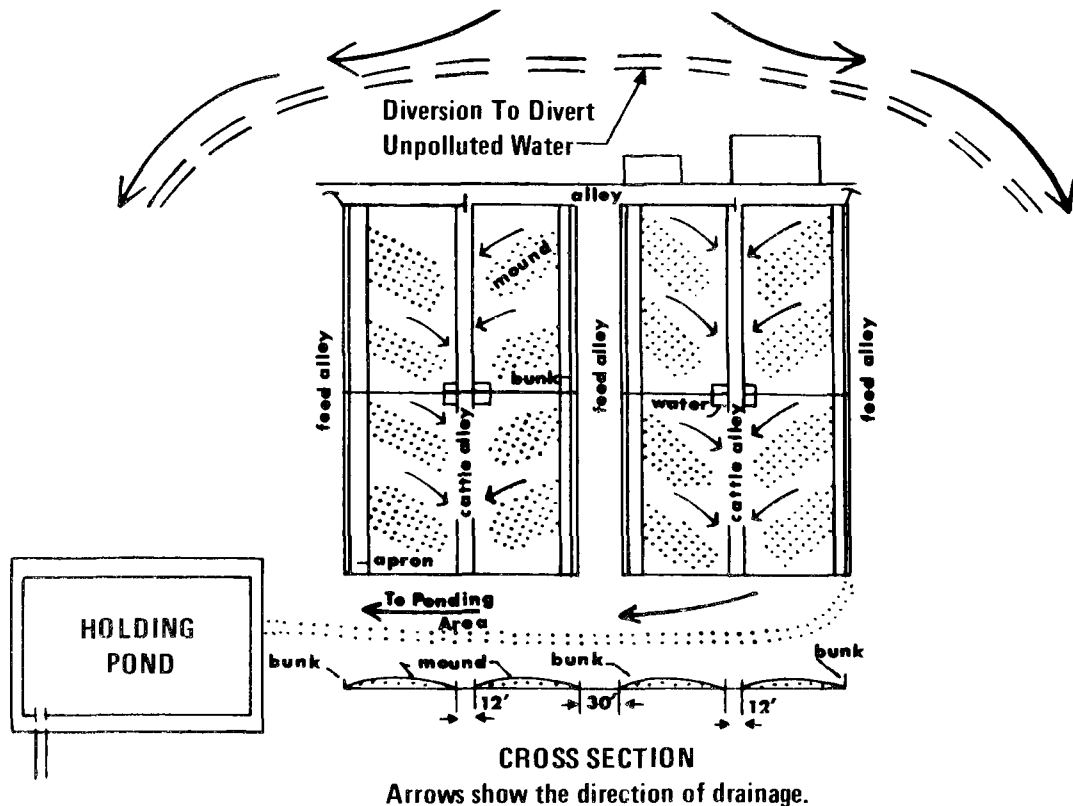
Sketch and Cross-section of Confined Animal Production Facility Showing Diversions Which Prevent Runoff From Entering The Site and Directing Contaminated Runoff Into a Holding Pond. Note Cross-section Showing Topography of Facility.
